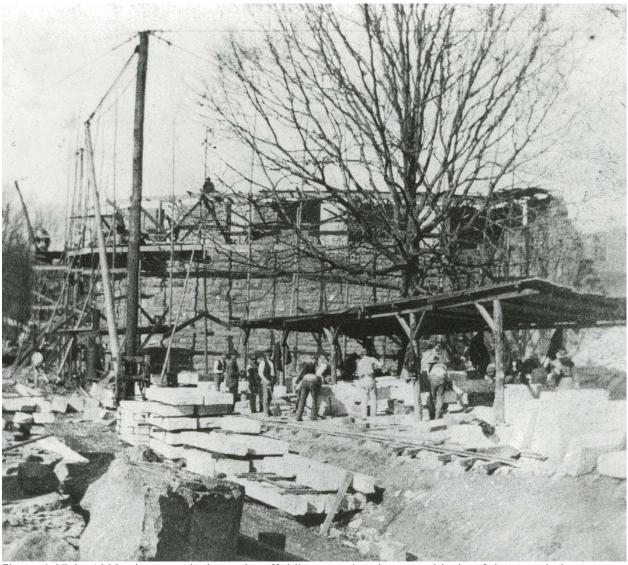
An 1898 photograph showed scaffolding covering the stone blocks of the rounded, rear façade of Cabell Hall during its construction. The large tree in the foreground remained during the construction activity. (R-JAV-SCL-OVH-1898-prints07728-BW-5-OldCabellConstr.jpg)
